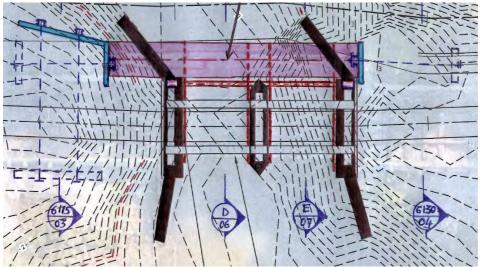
Plan view of cycleway clip on and rail bridge 10 BOIVR. Cycleway is highlighted pink.
